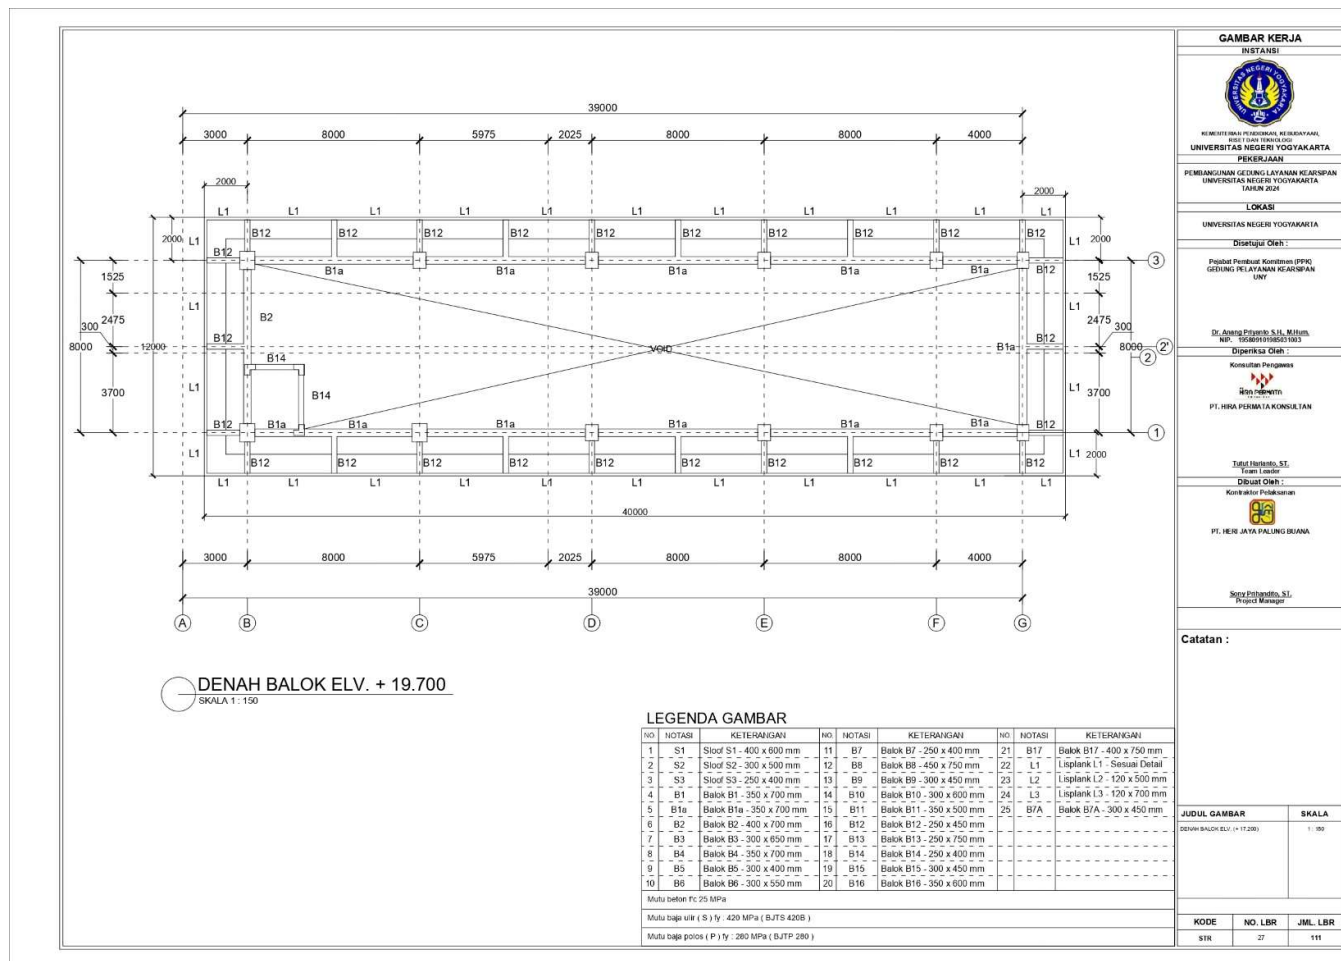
10 Beam Site Plan of Elv. +19.700
